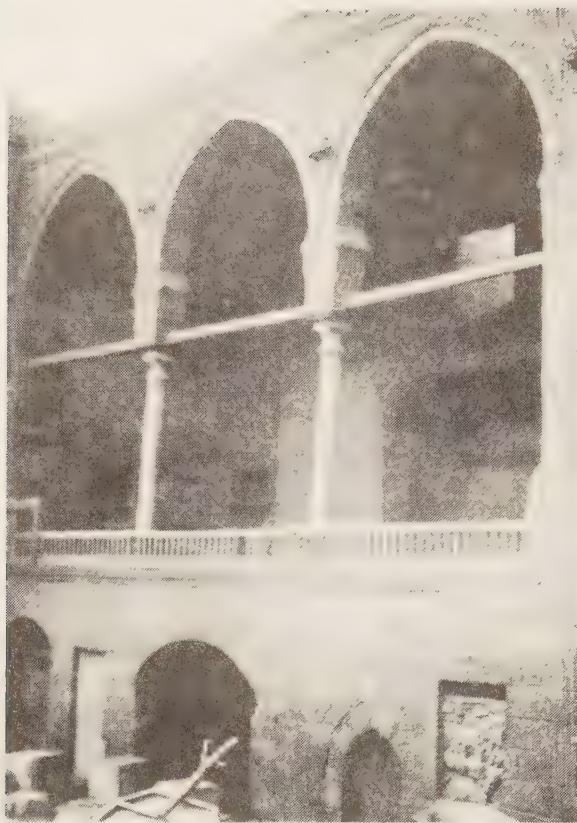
The second floor is constructed of sun-dried mud bricks with a timber beam inserted between the courses to prevent the wall from shrinking. The figure also shows that the second floor is built with a thinner wall and shaded by another building. (Revoult and Maury, 1975).
